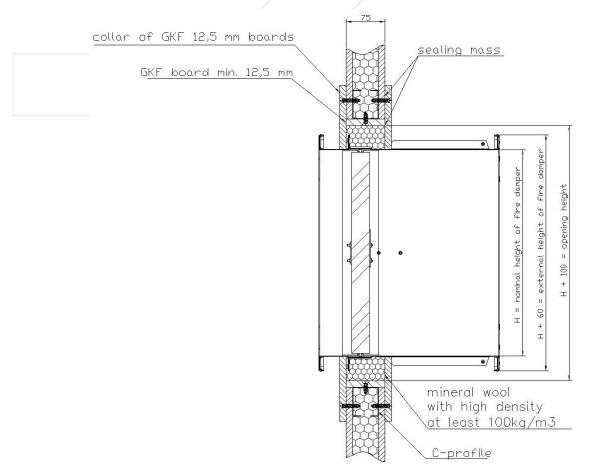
Installation method of fire dampers KWP-L in flexible wall 75 mm thick
